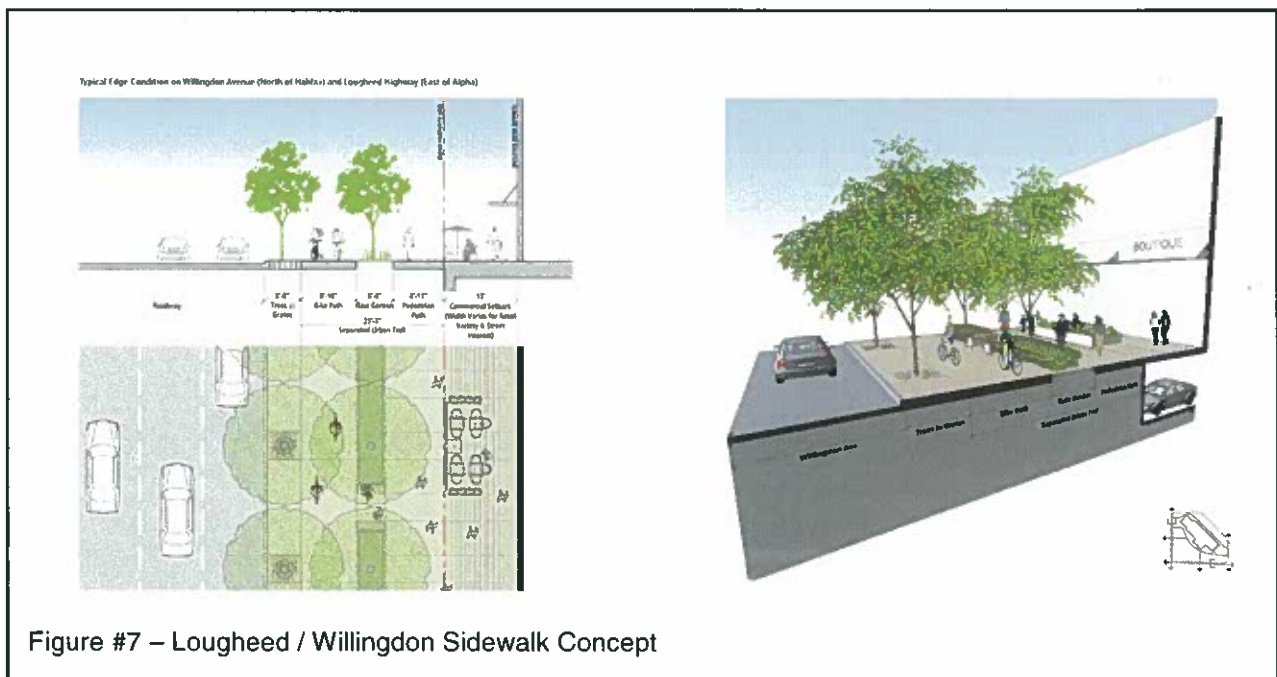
Lougheed / Willingdon Sidewalk Concept
